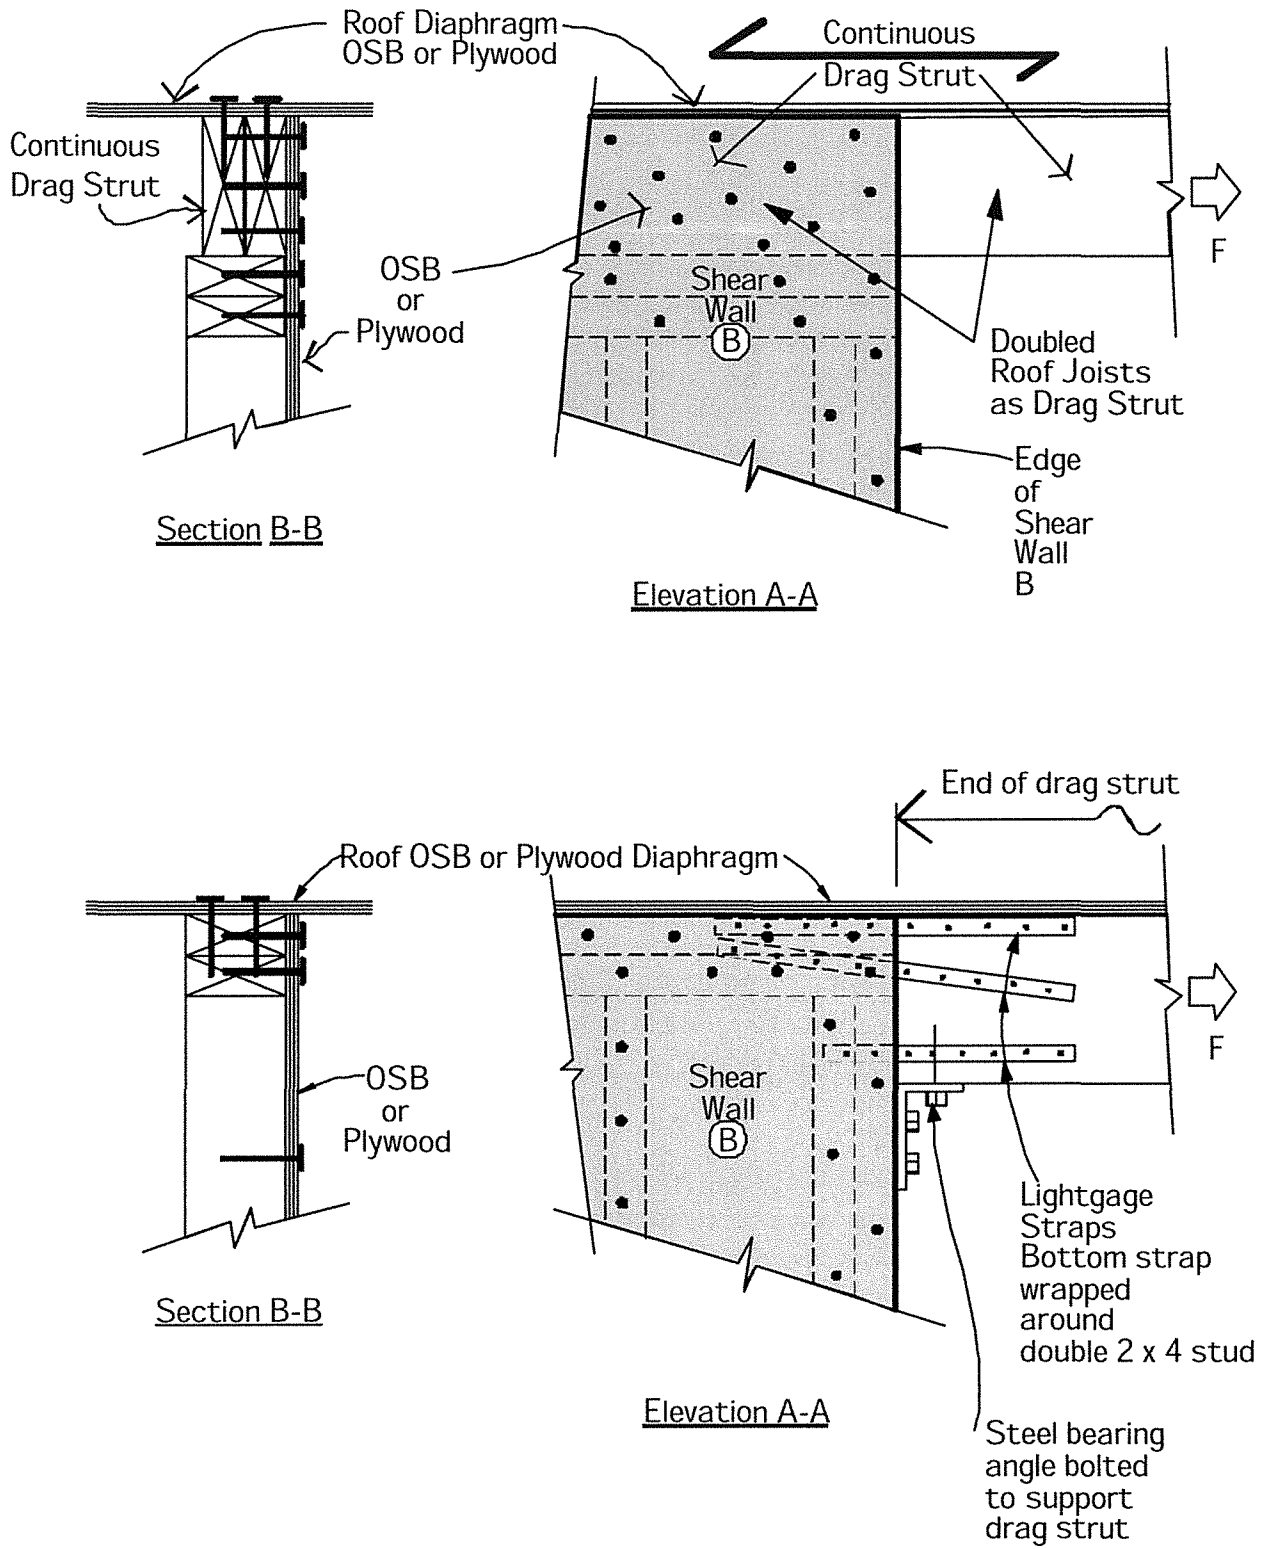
Alternate Drag Strut Connections to Shear Wall
